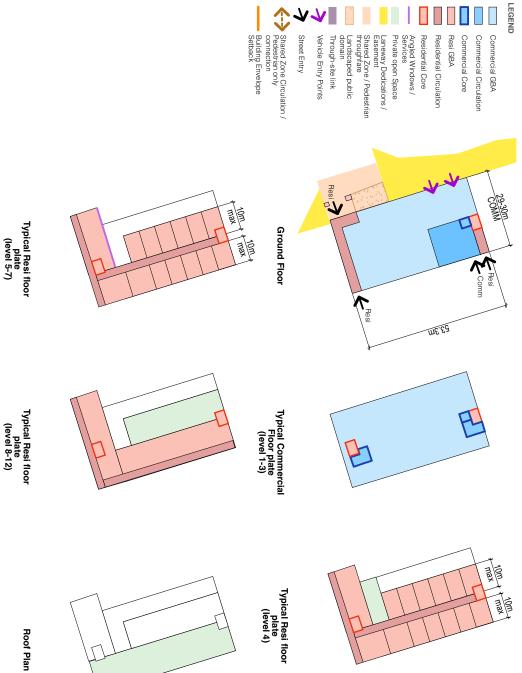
Proposed Site Specific Controls - Waterloo Metro Quarter - Affordable Housing - possible floor plan arrangements
